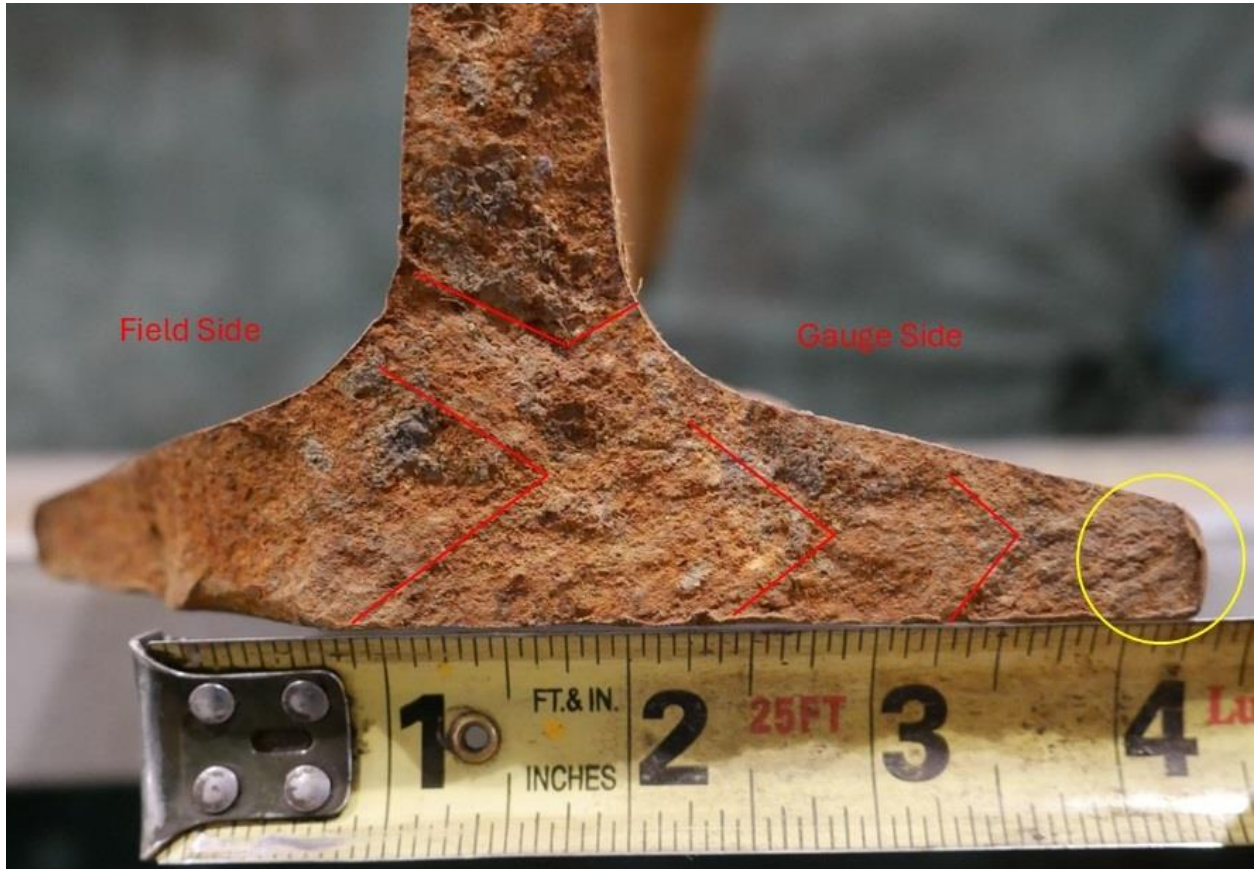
A closeup of the bottom half of the fracture face highlighting the chevrons (red) pointing towards fracture initiation location (circled in yellow).
